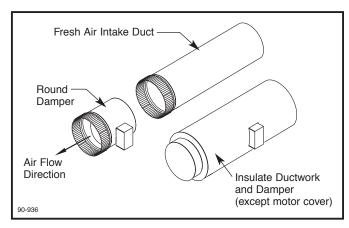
DAMPER AND FRESH AIR DUCT INSTALLATION
